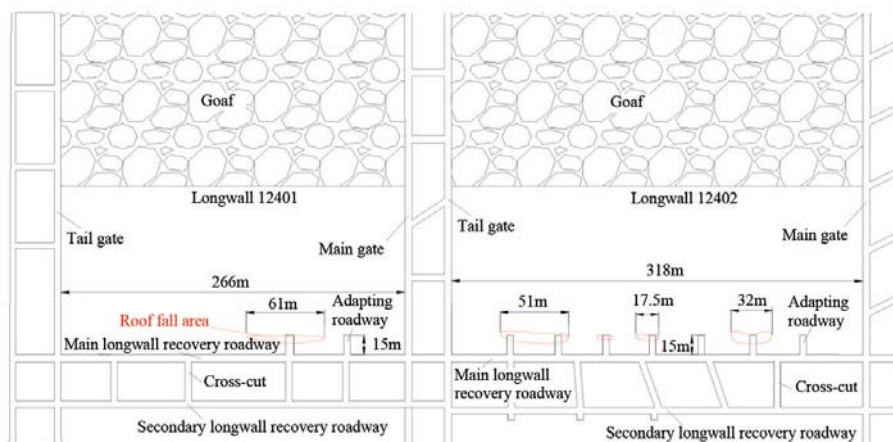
Roof fall areas and roadway layout of longwalls 12401 and 12402
